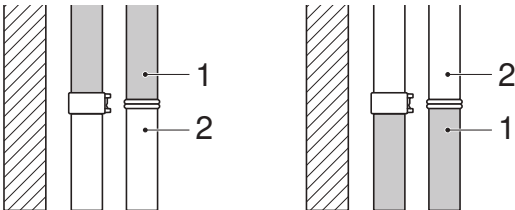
Adapter with Geberit electrofusion coupling or butt welding
